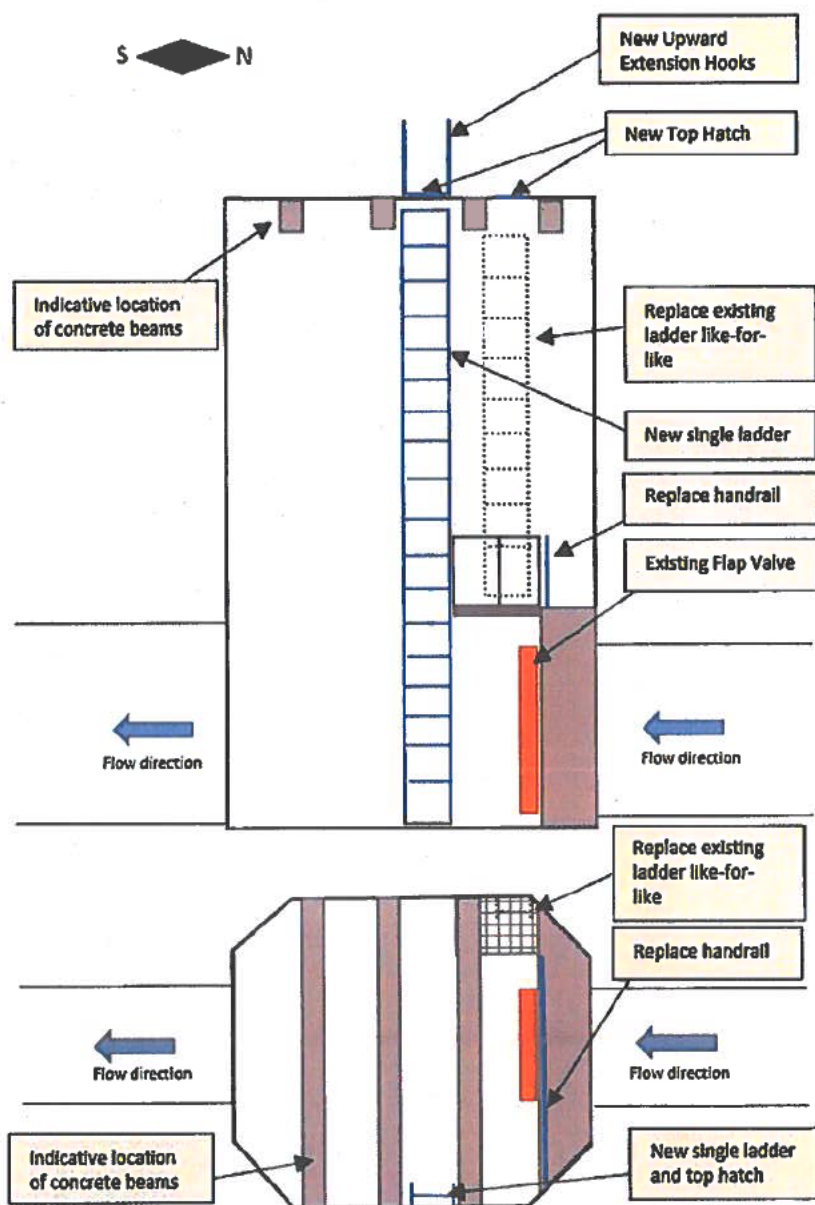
Bulverhythe Outfall – Inner Chamber. Indicative existing and proposed arrangement sketch (cross section and plan view).
